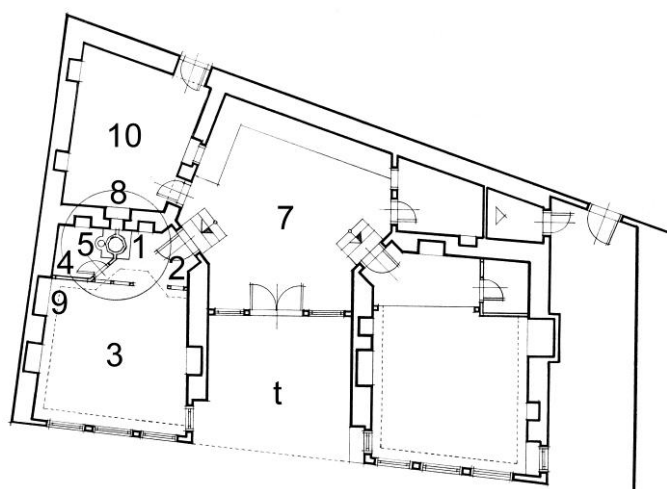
Ground floor layout of the house [H-“T.Ç.P.”], built in Prizren
